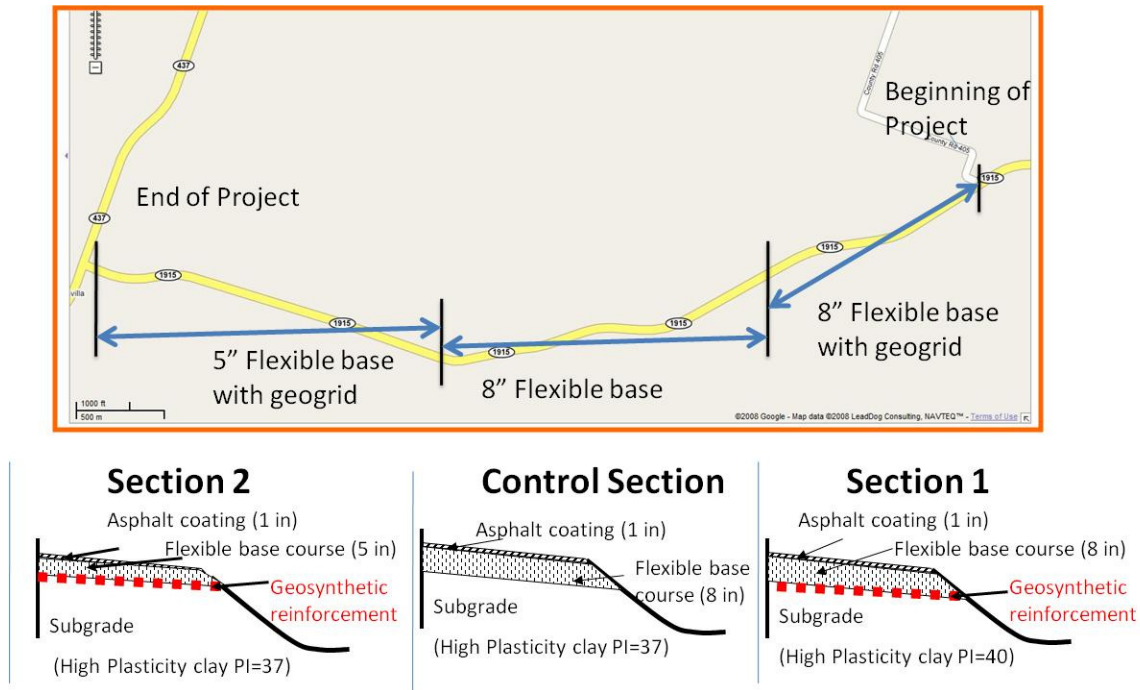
Project details and cross section of test sections at FM 1915 site
